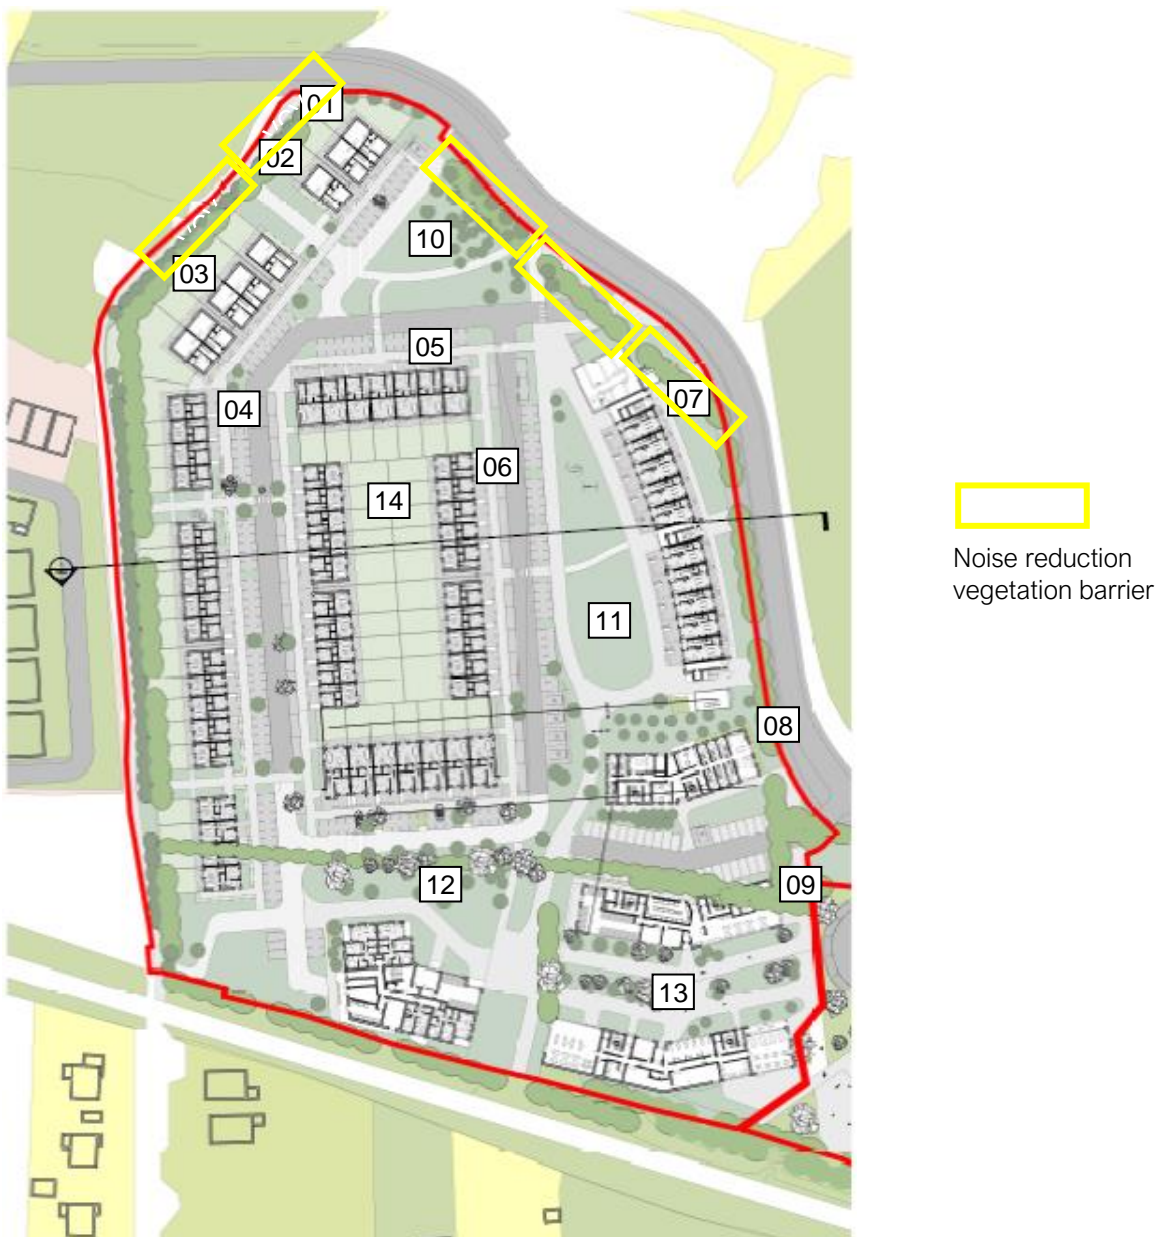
Highlighted vegetation barriers on the proposed development site.
